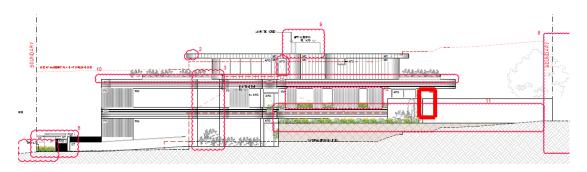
Plan extract DA200(C) depicting the extent of the proposed 2 storey element extending into the rear 25% area of the subject site with a maximum 1.2 metre breach in the south-western corner of the building
